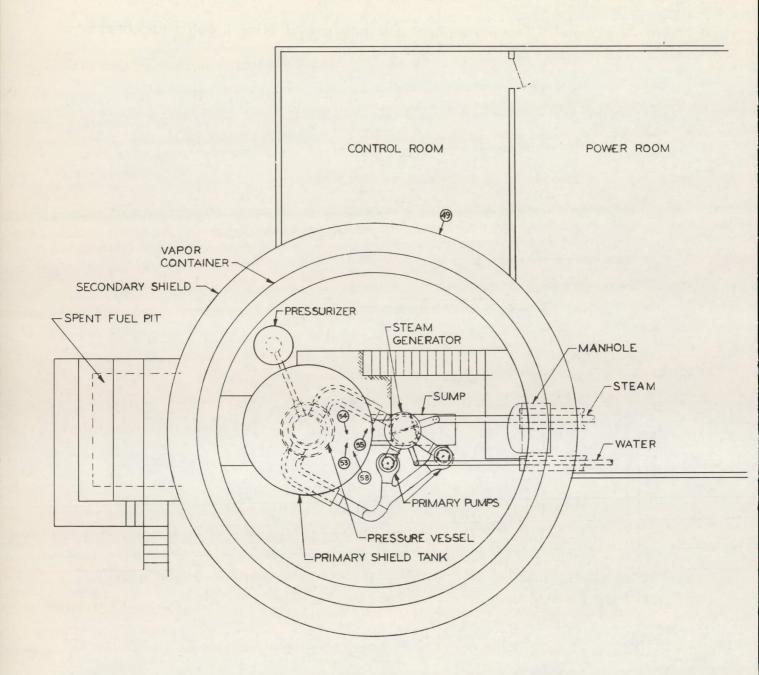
PLANT PLAN SHOWING SHIELD MEASUREMENT LOCATIONS
